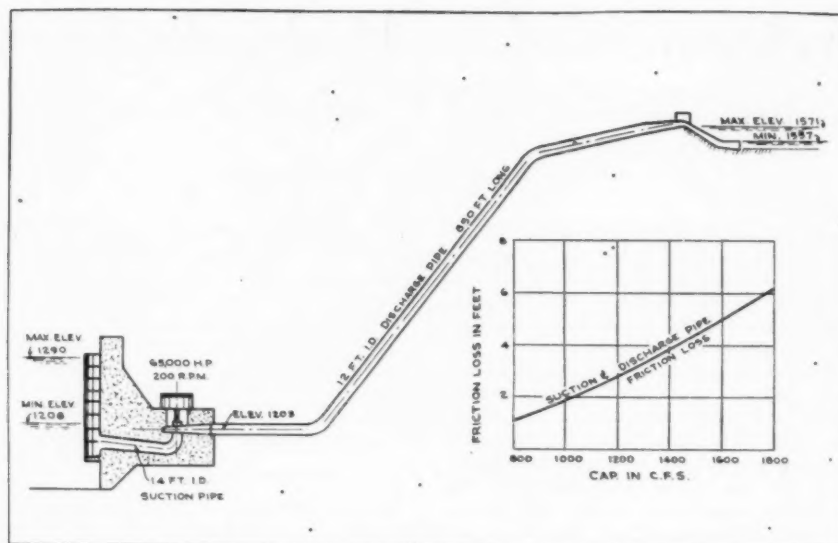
SECTIONAL ELEVATION OF GRAND COULEE PUMPING PLANT
